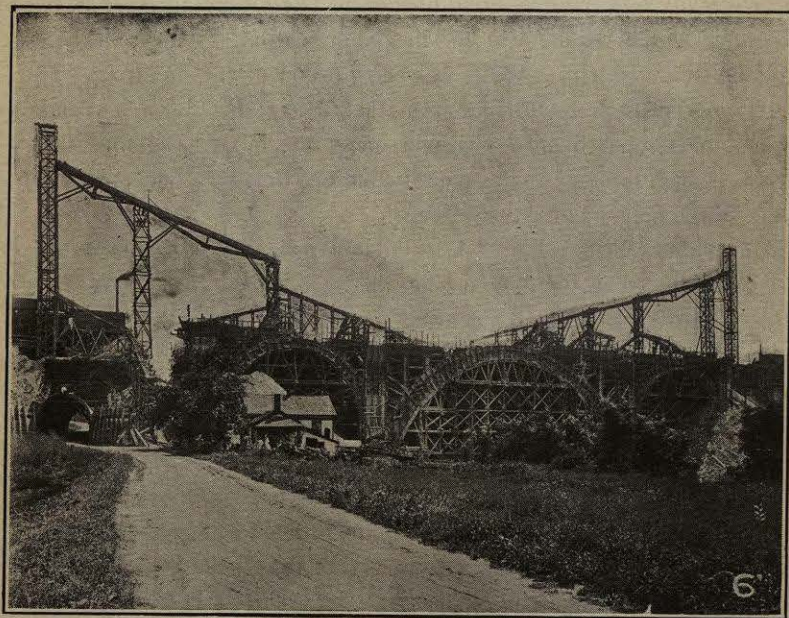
Mixing plant at Painesville Bridge. (See p. 275.)
